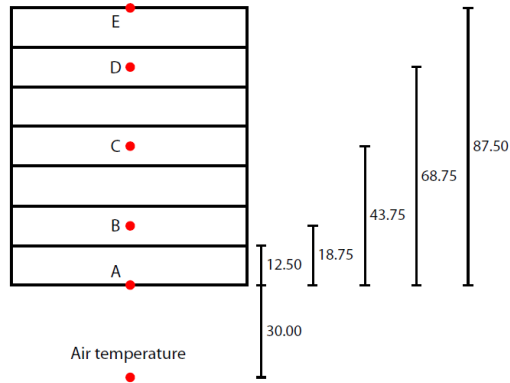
Attachments of thermocouples within the ceiling element, cross section view (gypsum layer). All units are in mm.
